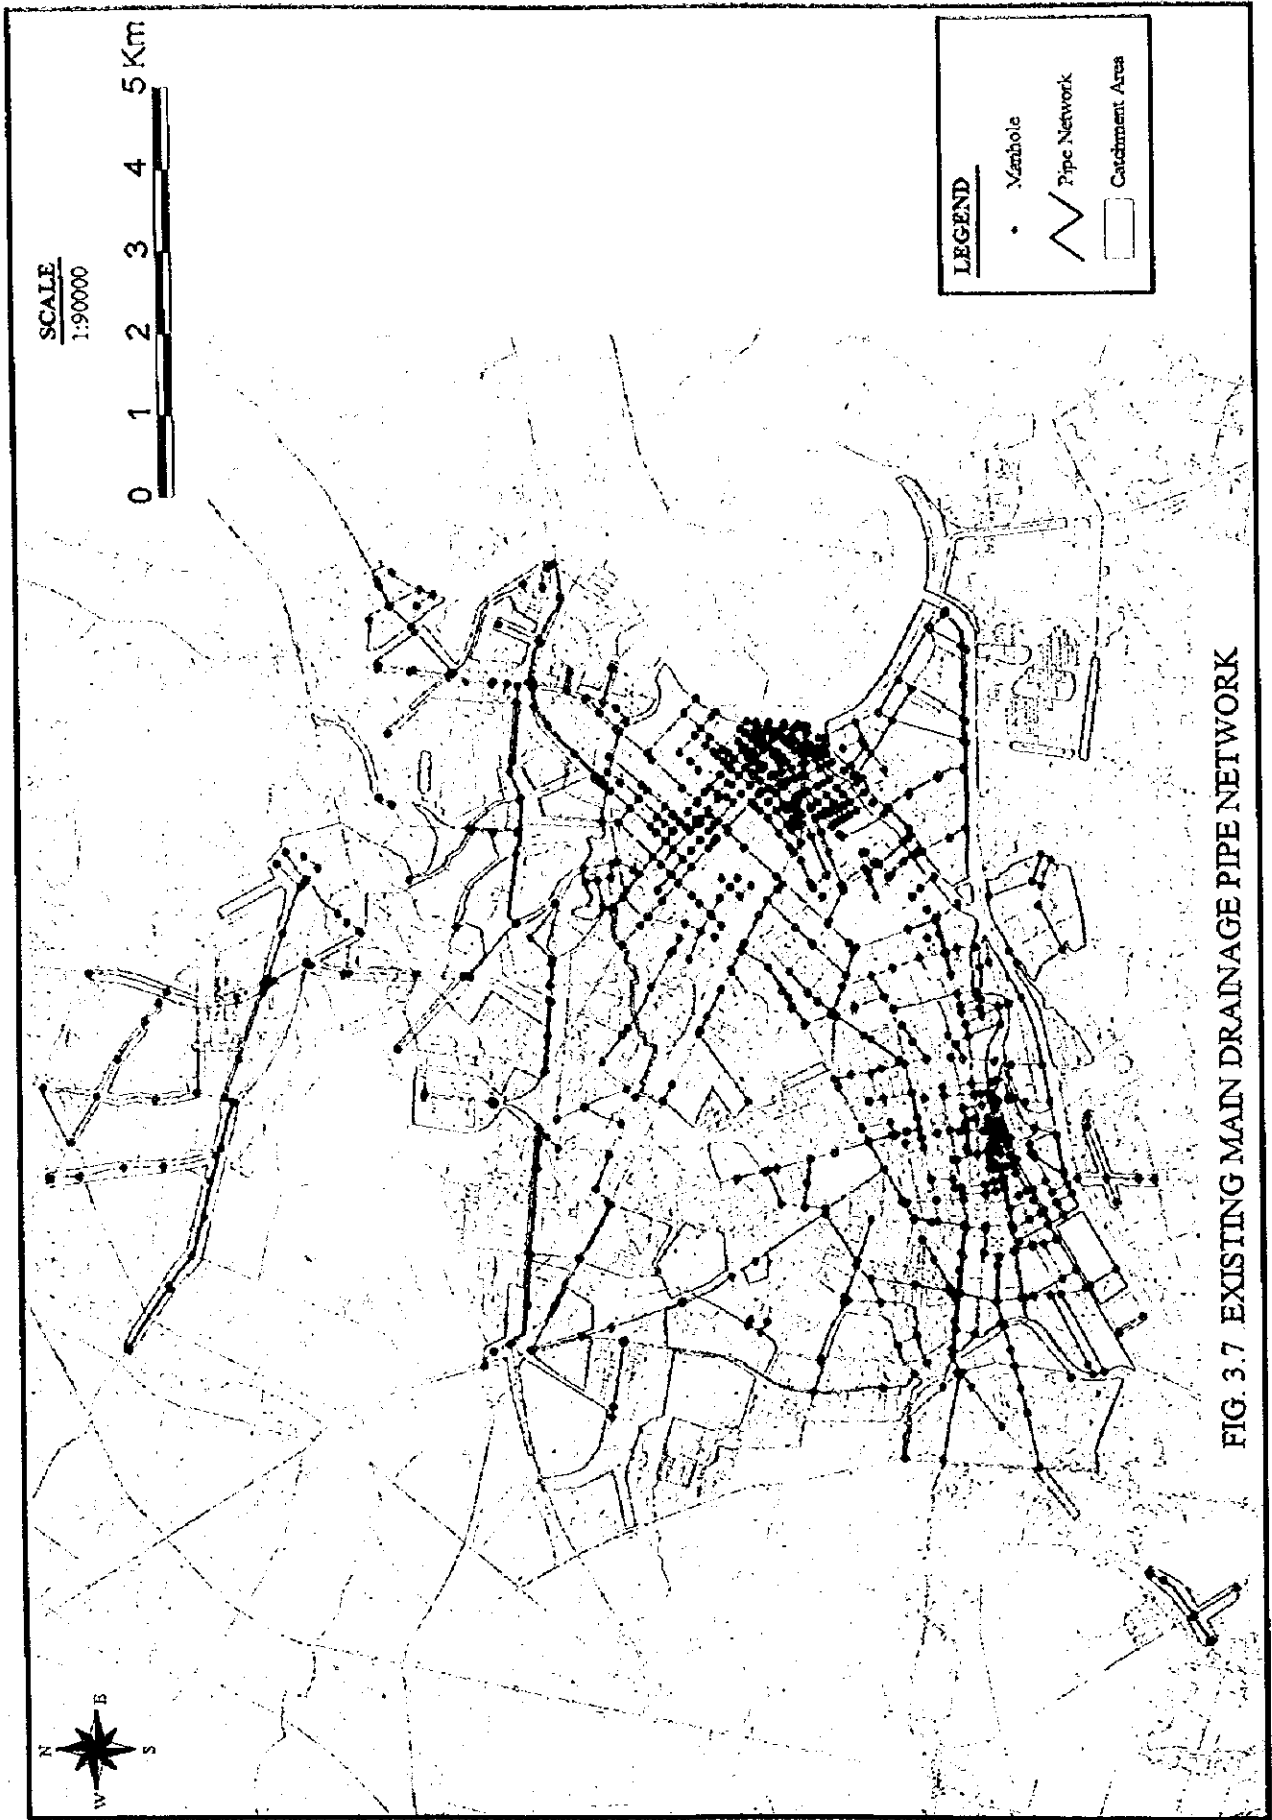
EXISTING MAIN DRAINAGE PIPE NETWORK
